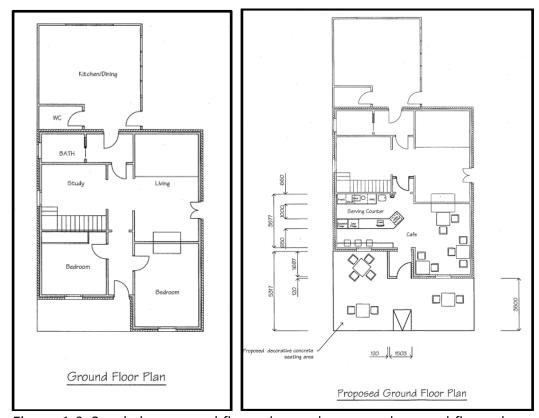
& 2: existing ground floor plan and proposed ground floor plan
